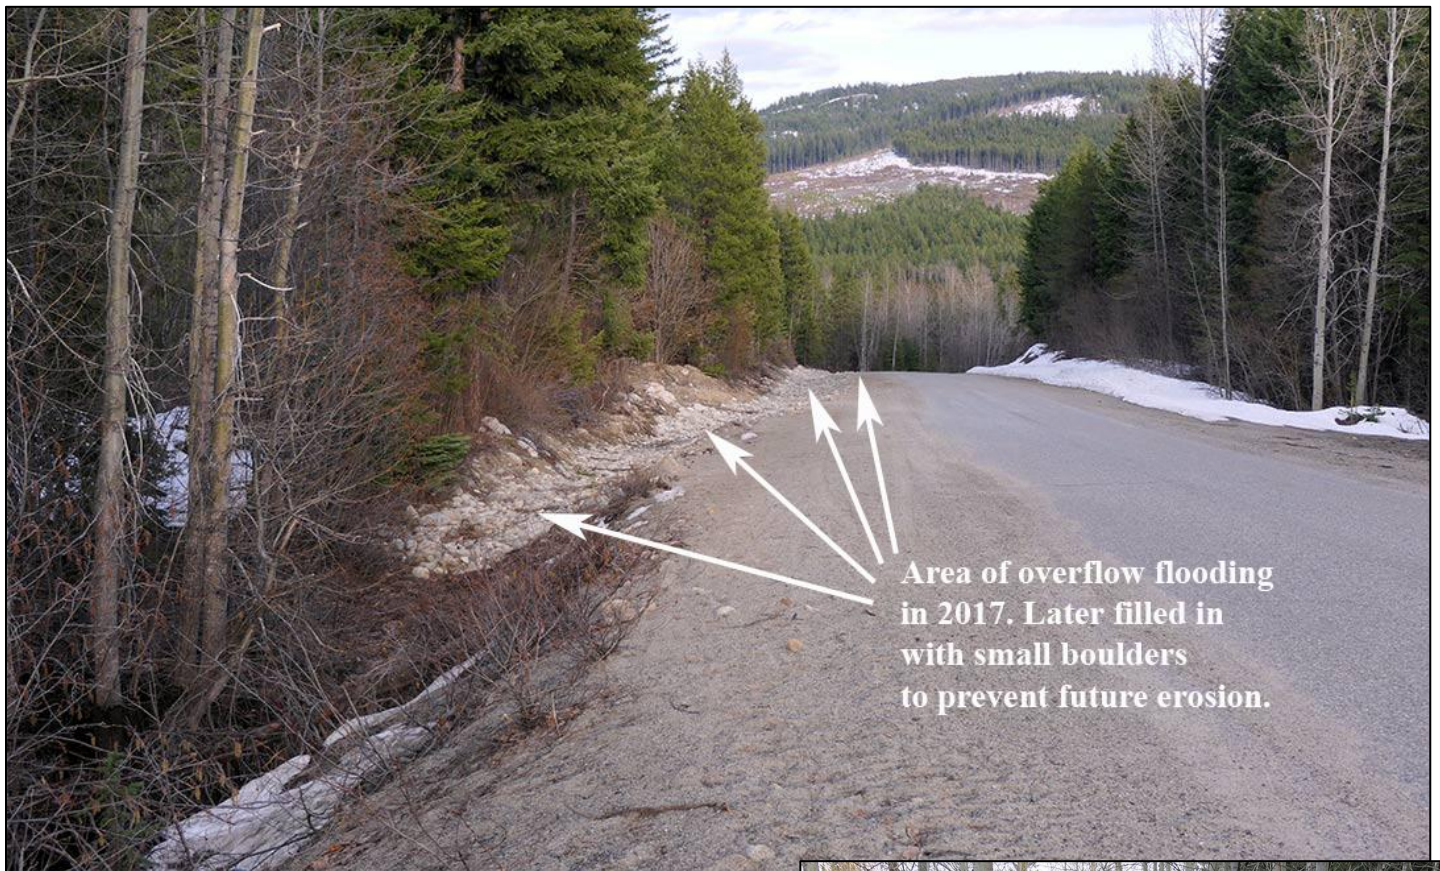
, above (April 30, 2018). Close up of area in Photo 67. The water runoff was too much for the small culvert under the Princeton road in 2017, and no doubt due to some blockage, that the water quickly pooled in the area to left bottom of photo, and then spilled down the road ditch, eroding the ditch.
